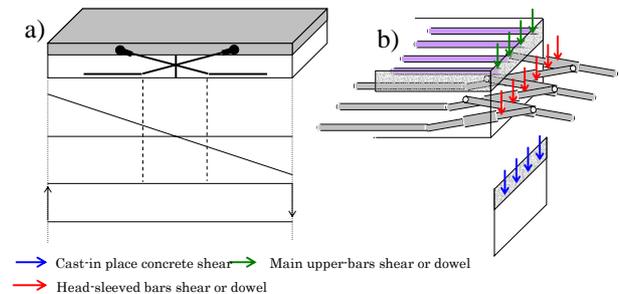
Moment and shear distribution (a), and assumed forces at connection of crossed-bars beam No.3-2 (b)
